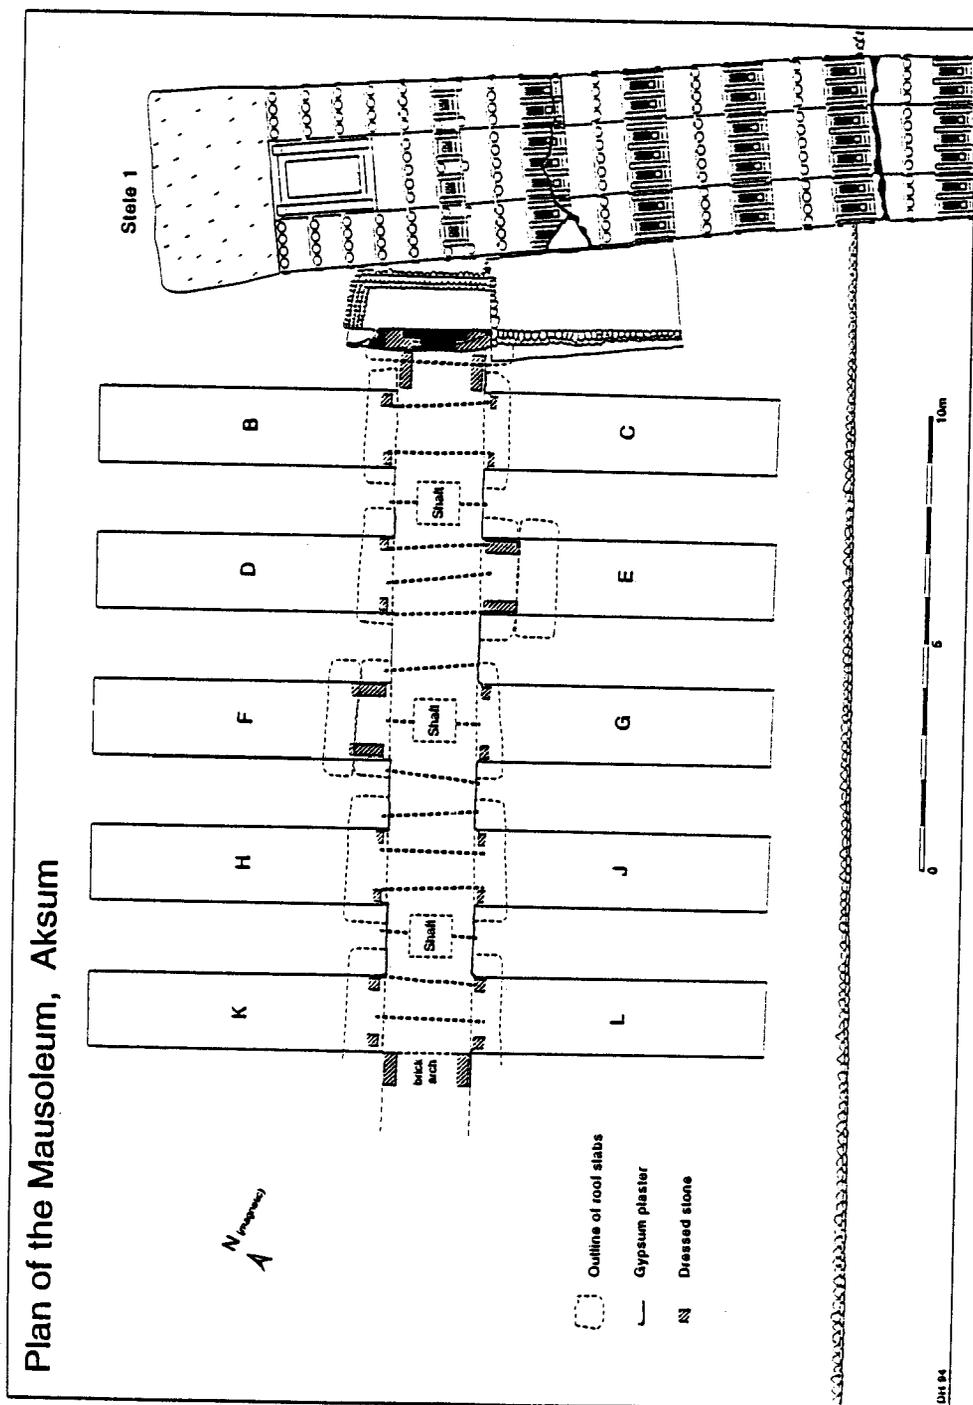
Plan of the Mausoleum, as excavated in 1993.
